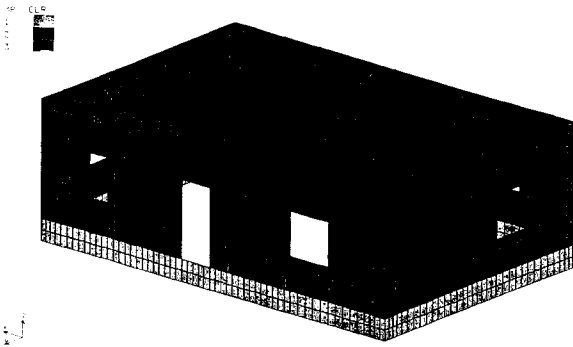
Model A5. Vertical and Horizontal Reinforced Concrete tie-beams and tie-columns.
